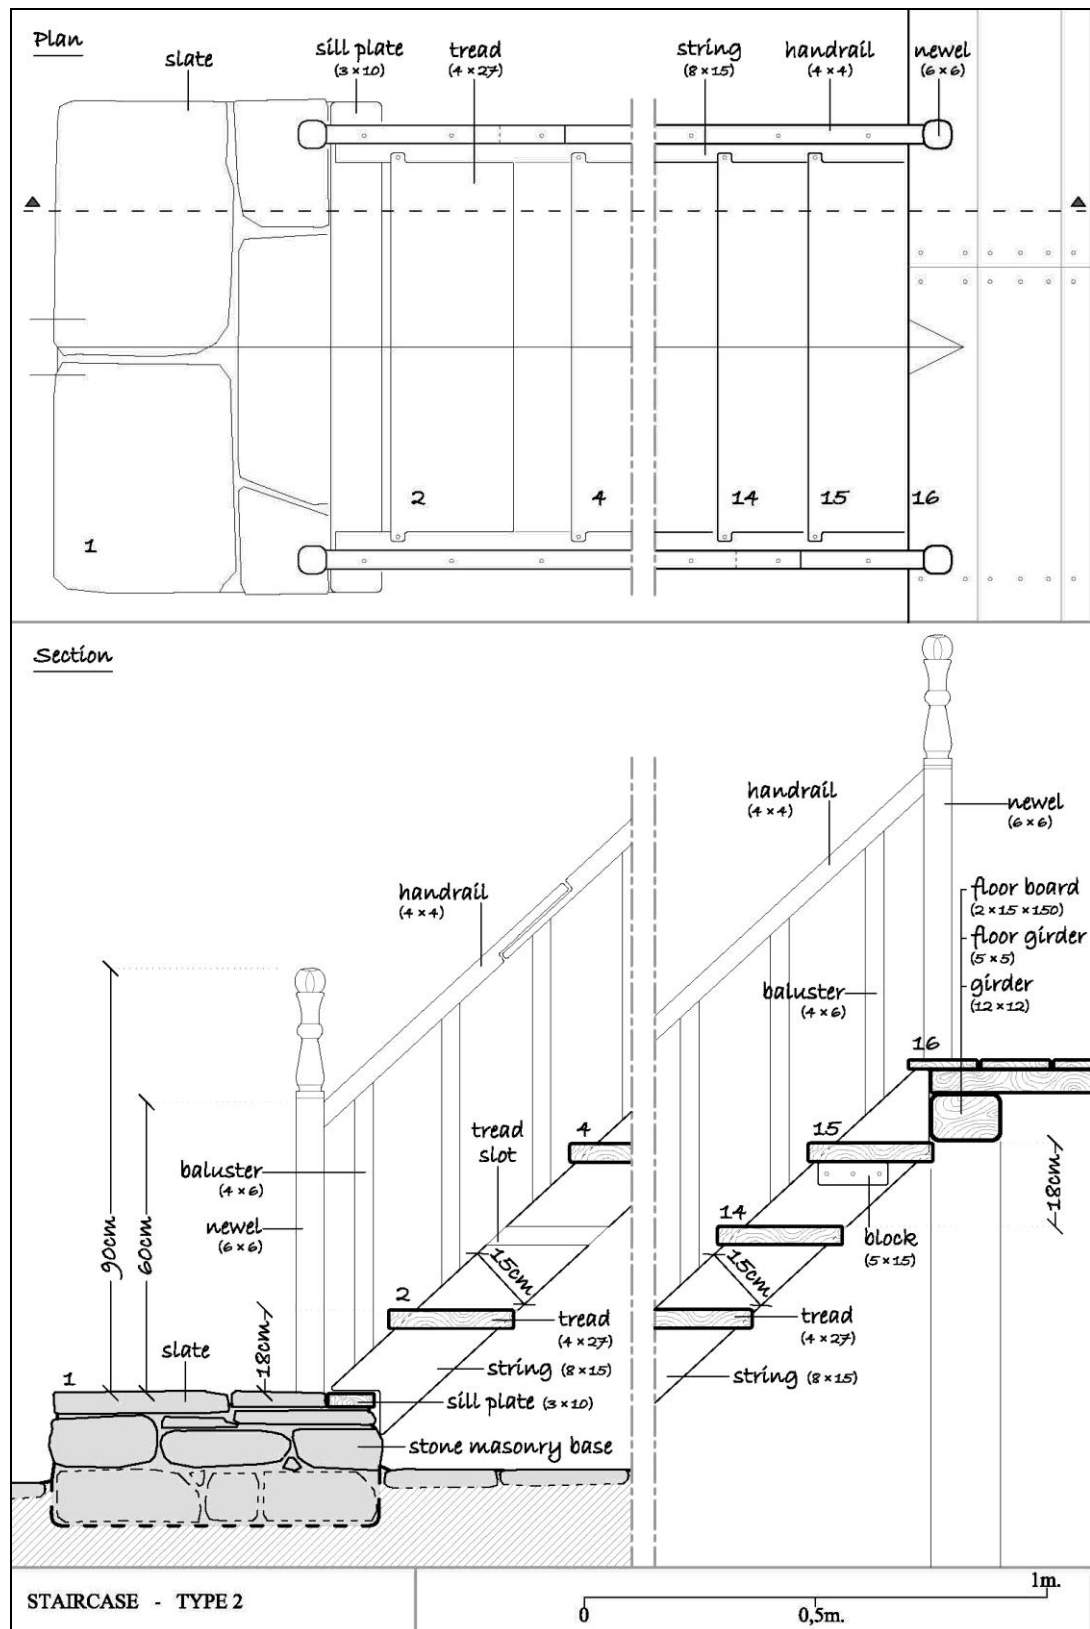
, Plan and section of timber staircase sitting on a stone masonry step
